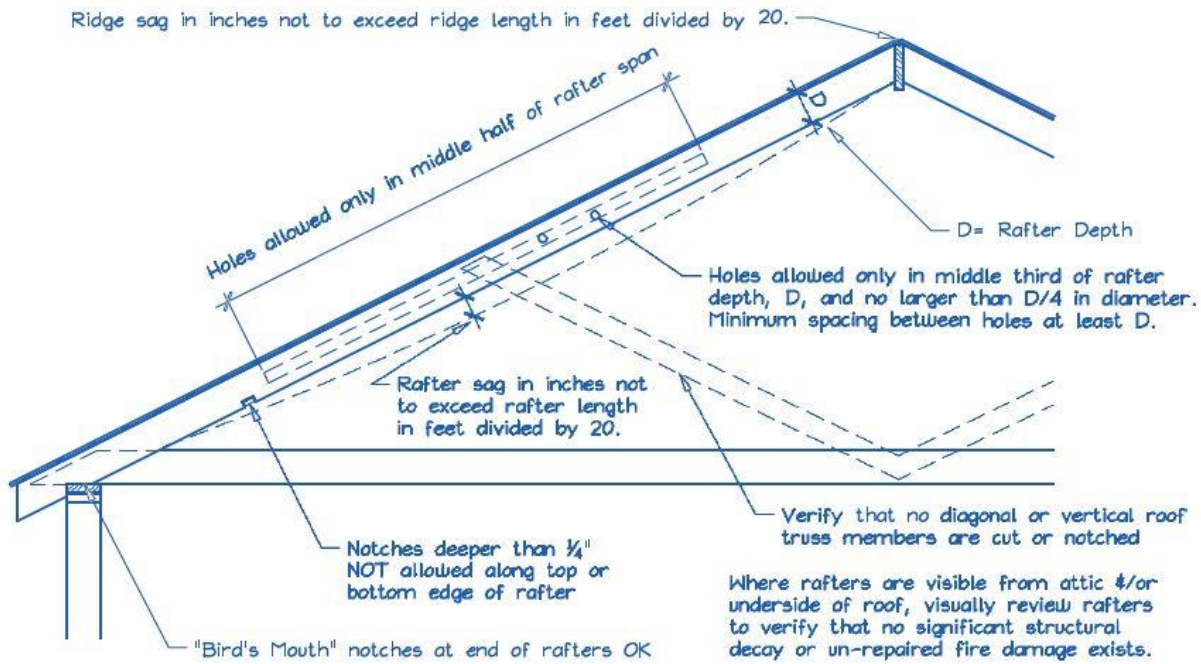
Roof Visual Structural Review of Existing Conditions. (Site Audit)
